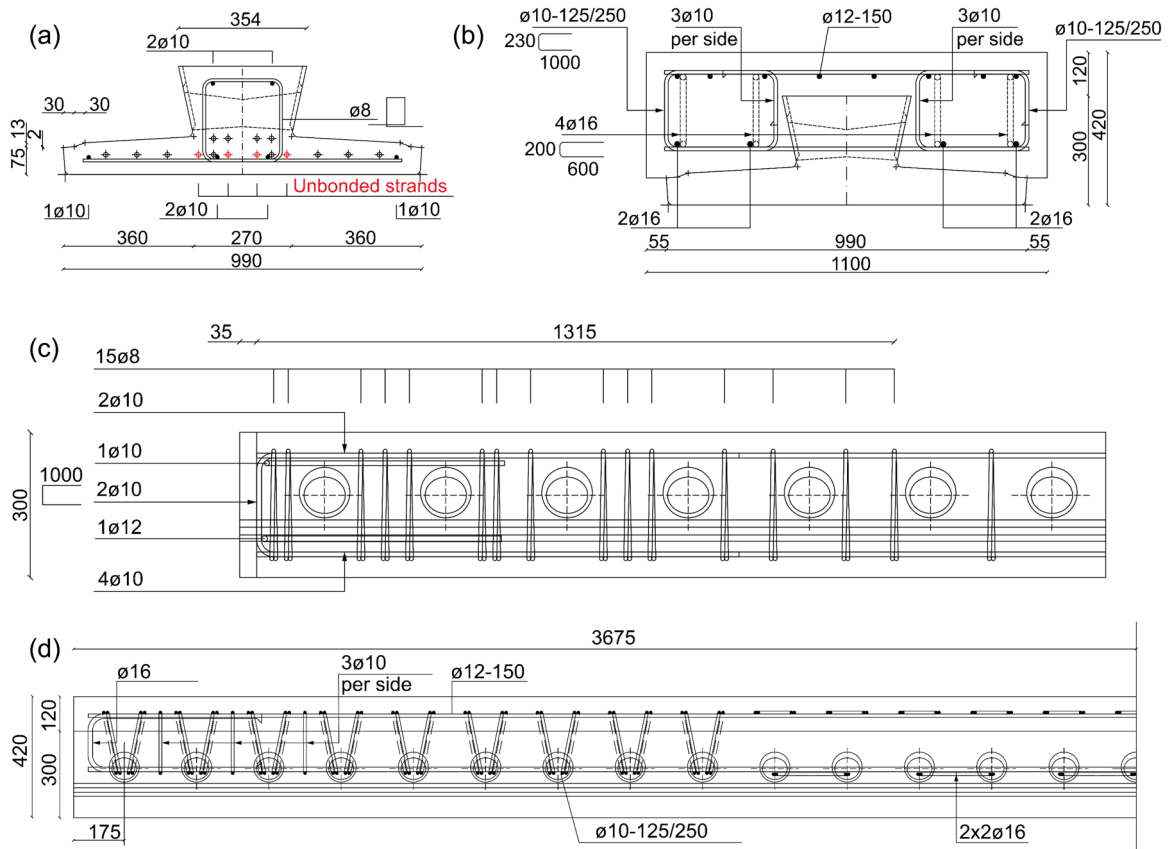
Geometry, strand layout, and reinforcement layout of precast beam and cast-in-situ topping layer (unit: mm). (a) Cross-section and strand layout of precast beams. (b) Cross-section and reinforcement layout of cast-in-situ topping layer. (c) Shear reinforcement layout at the end of precast beams. (d) Shear reinforcement layout of the cast-in-situ topping layer.
